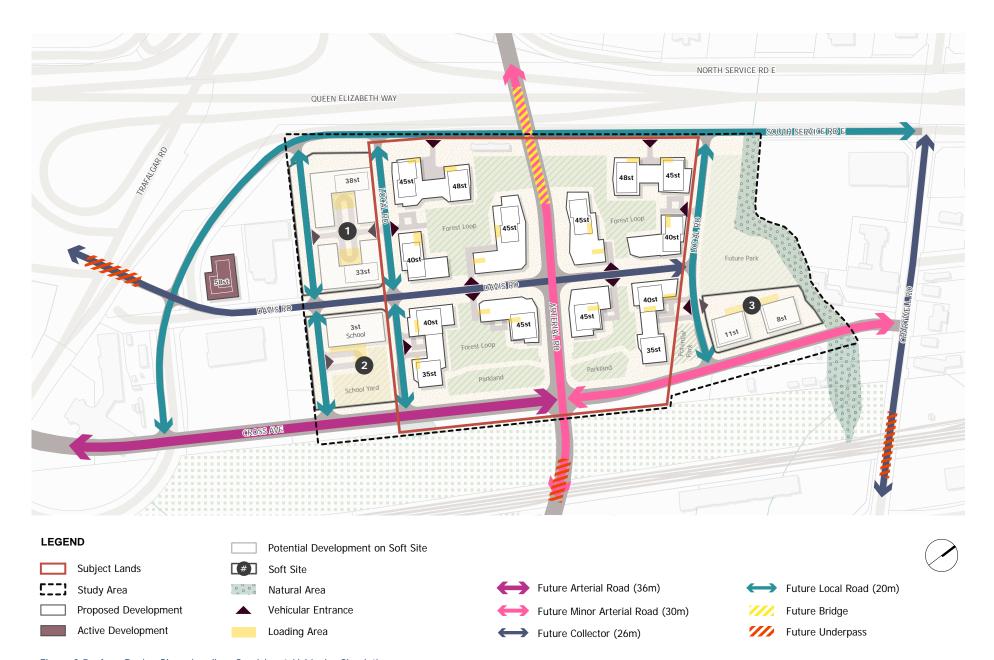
Area Design Plan - Loading, Servicing & Vehicular Circulation
